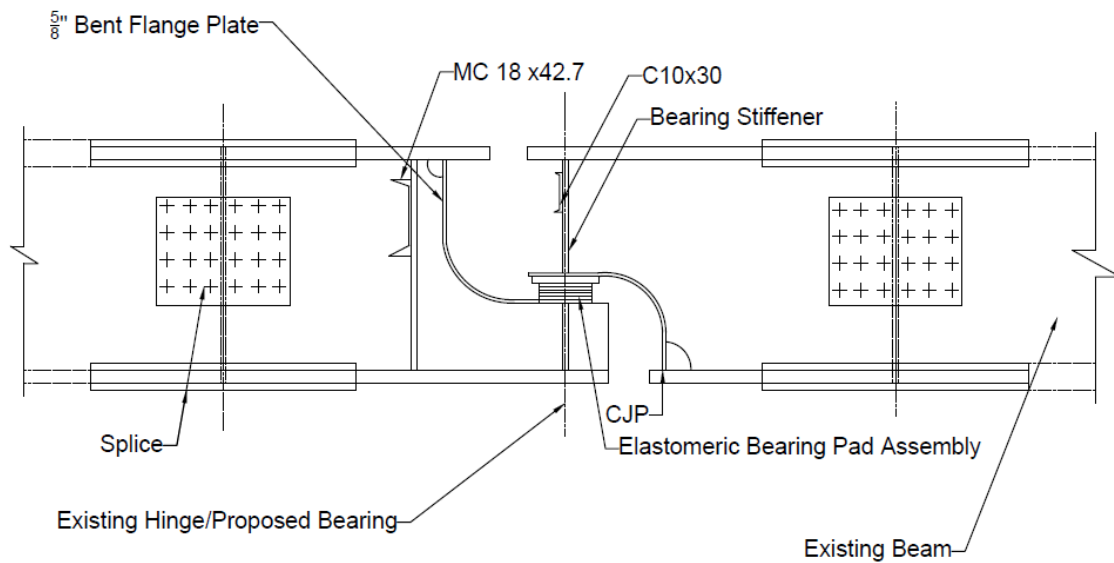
Ship lap joint detail (Mass DOT, 2014).
